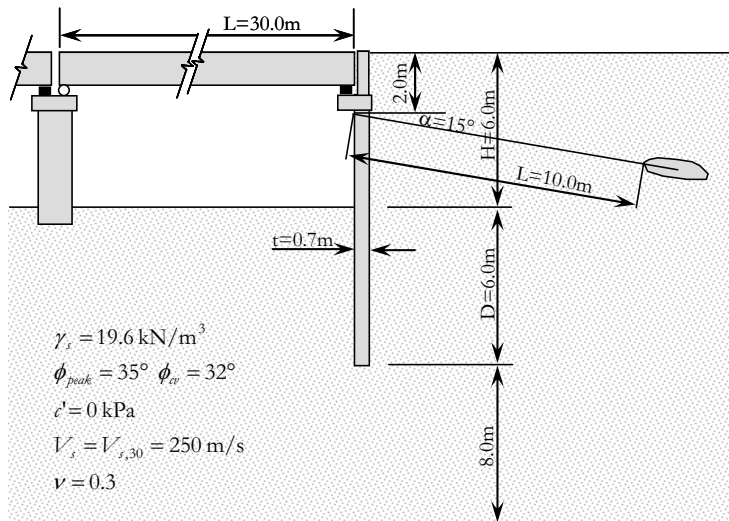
Diaphragm abutment retrofitted with anchor ties.
